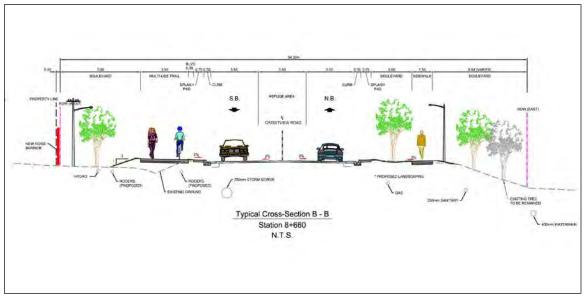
Creditview Road Class EA, Preliminary Preferred Alternative: Typical Cross-Section B-B at Station 8+660 [AECOM, 2015].
